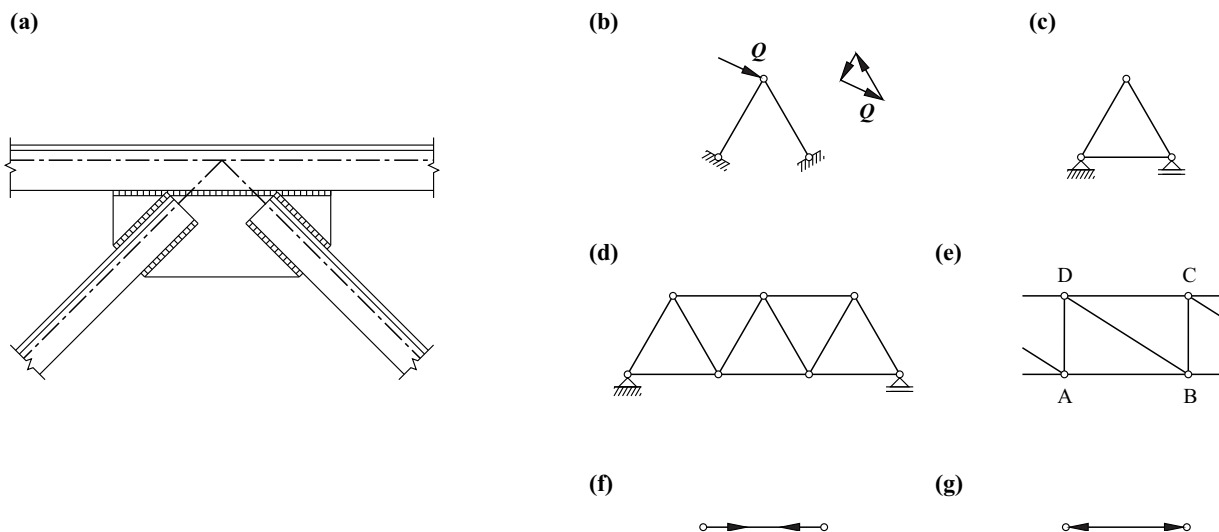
Trusses: (a) typical joint, (b) resolving a joint load into two bar forces, (c) basic truss element, (d) connecting new joints via pairs of bars (WARREN truss), (e) PRATT truss, (f) tie, (g) strut
